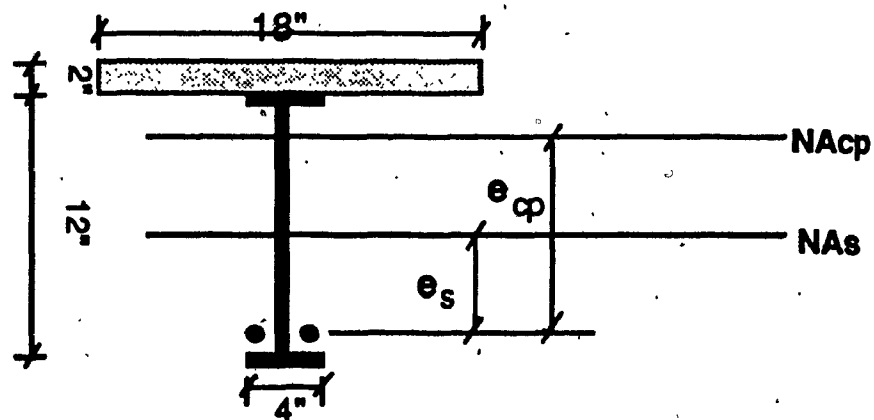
CROSS SECTION OF COMPOSITE GIRDER
